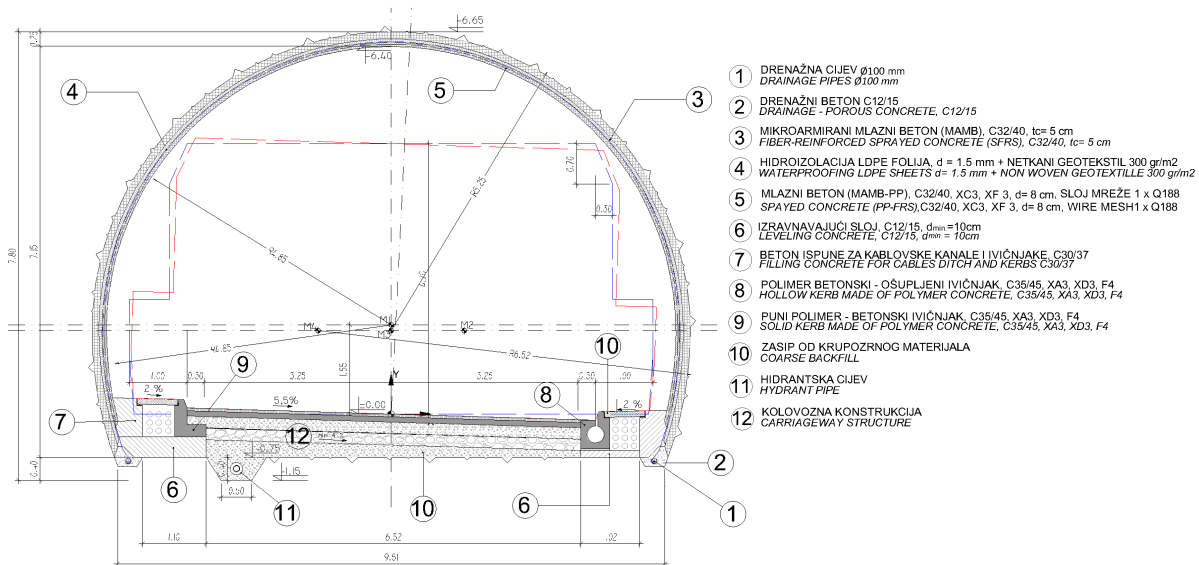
Typical cross-section of the tunnel with the single-layer load-bearing lining
